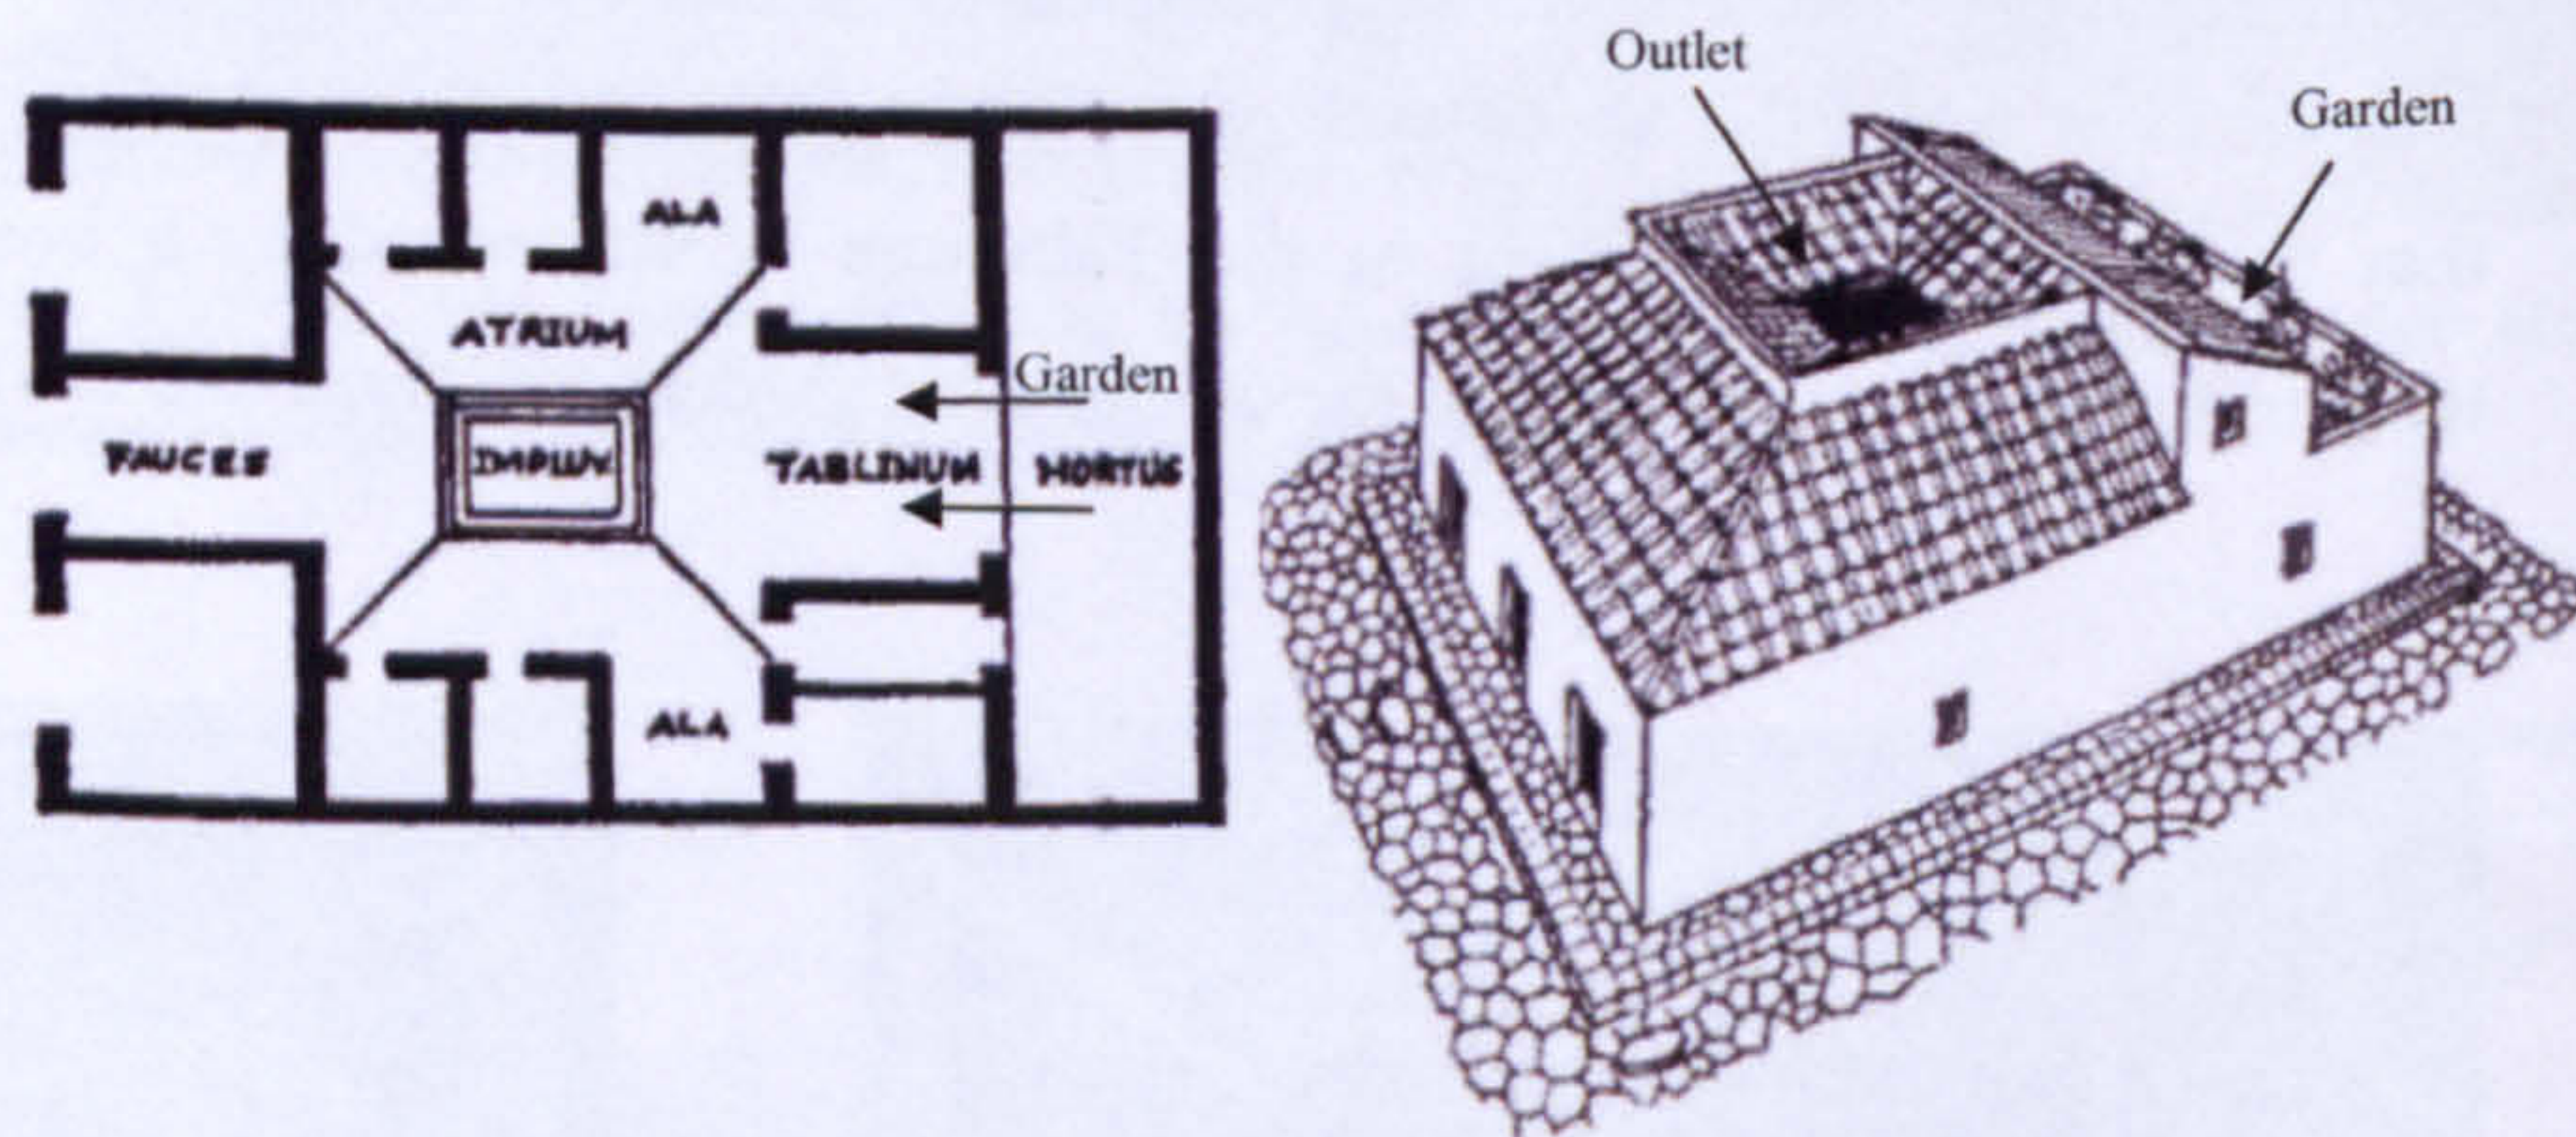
Domus Italica, plan and 3D reconstruction, Source: modified after McKay, 1998
